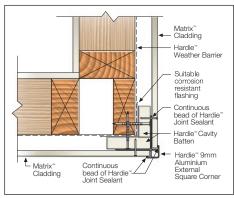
MATRIX™ EXTERNAL BOX CORNER DETAIL
